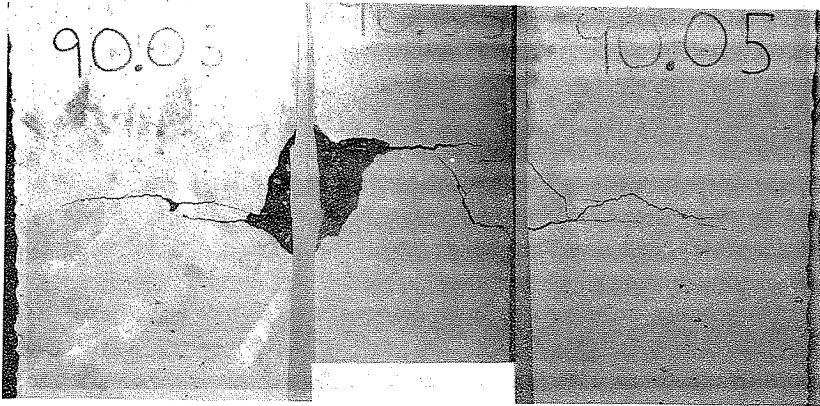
Failure of S.B.-specimen No. 90/05.
